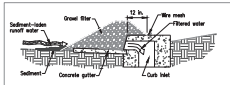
C. Cross-section detail of a gravel curb inlet protection.
